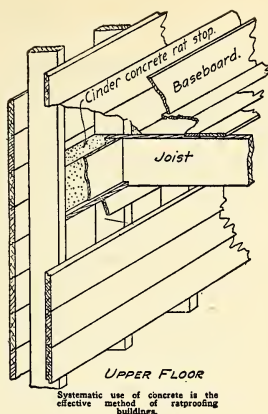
Upper floors of buildings used for food storage may also be made rat-proof.
